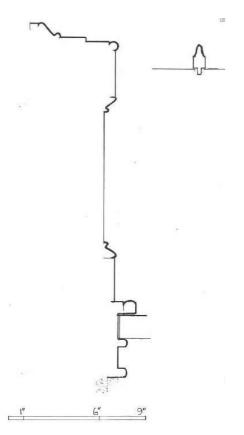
Wall joinery detail; Source: Roxburgh 1975:249
